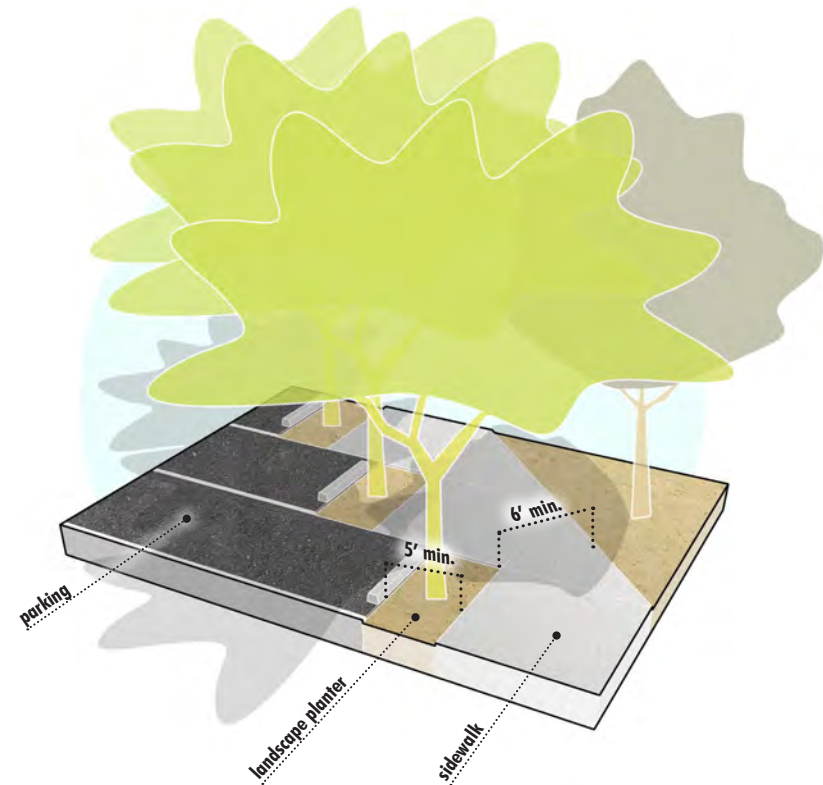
TOOLBOX - PARKING- 45 & 60 DEGREE
